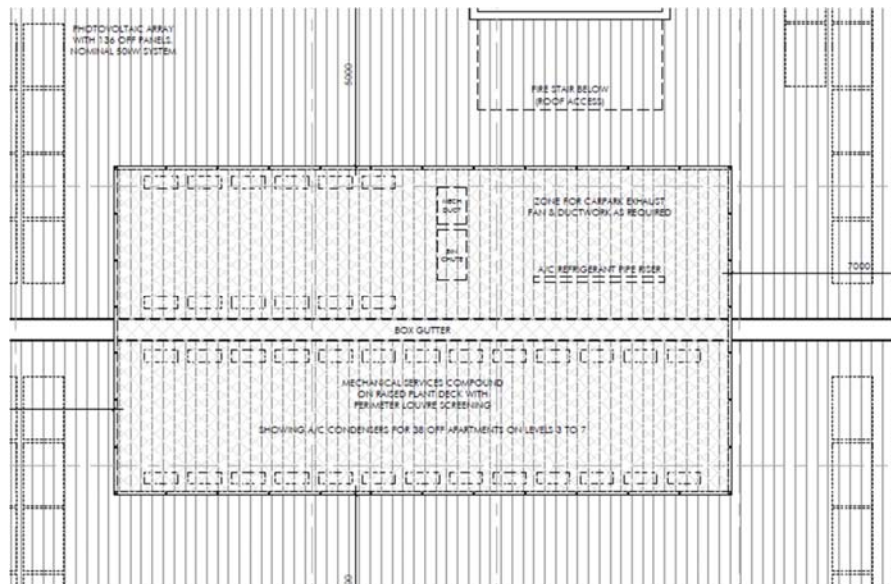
ROOFPLAN EXTRACT SHOWING AC DECK
